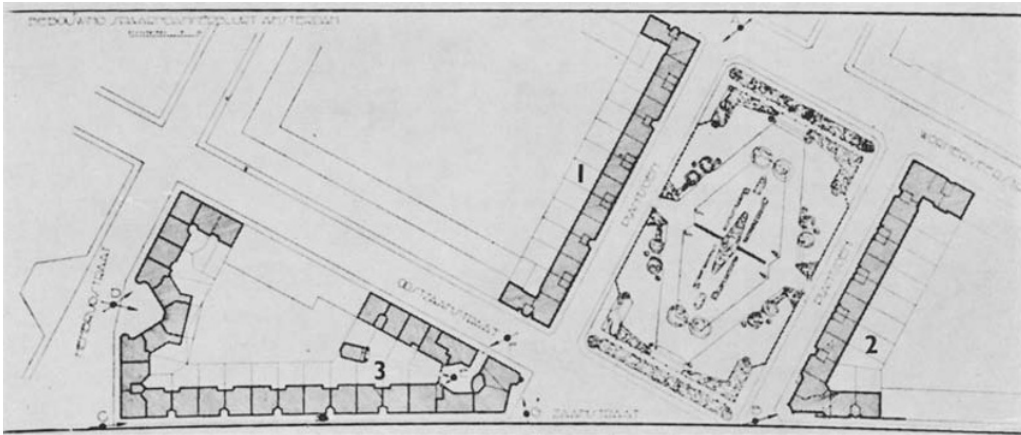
SITE PLAN OF THE THREE SPAARNDAMMERBUURT BUILDINGS AND PARK DESIGNED BY MICHEL DE KLERK. (Block 1, 1914-1915; block 2, 1915-1918; block 3, 1917-1920) Plan of site: *Wendingen*, vol. 6, nos. 9 and 10 (1924), p. 9.
